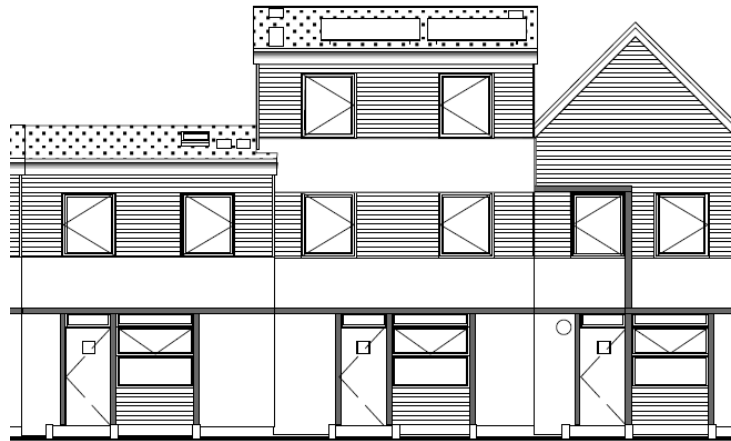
Front elevation showing window arrangement at type 1(left), type 3 (centre) and type 2 (right) houses
